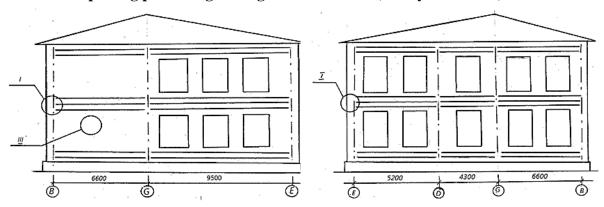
The scheme of strengthening the outer brick walls of the building by placing pre-strengthening reinforcements (side facades)
